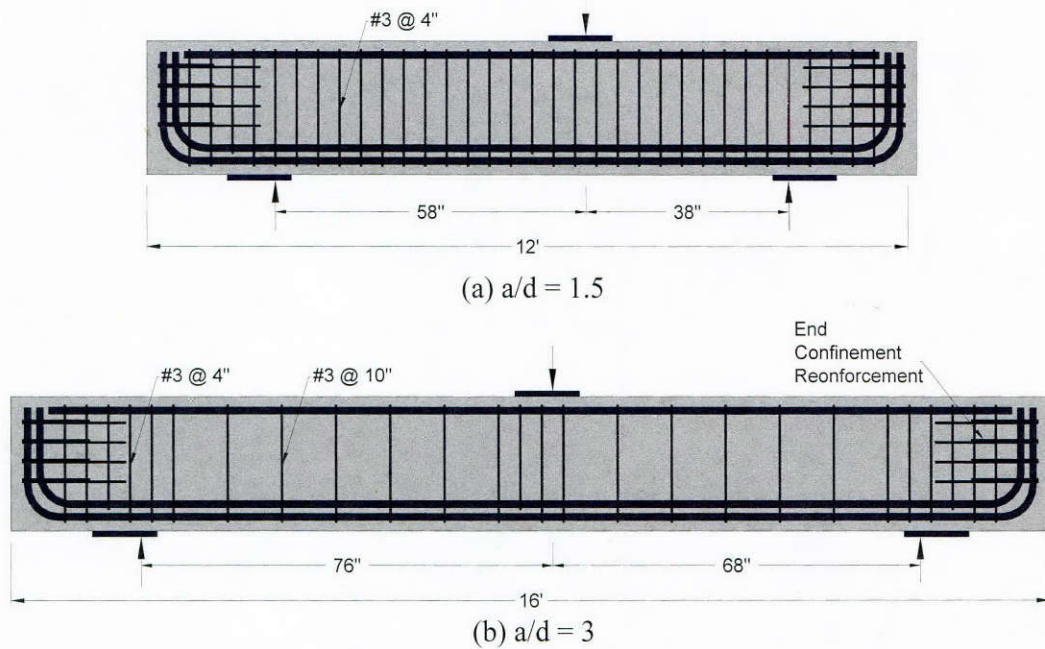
Transverse reinforcement for 24-in. T-beams
